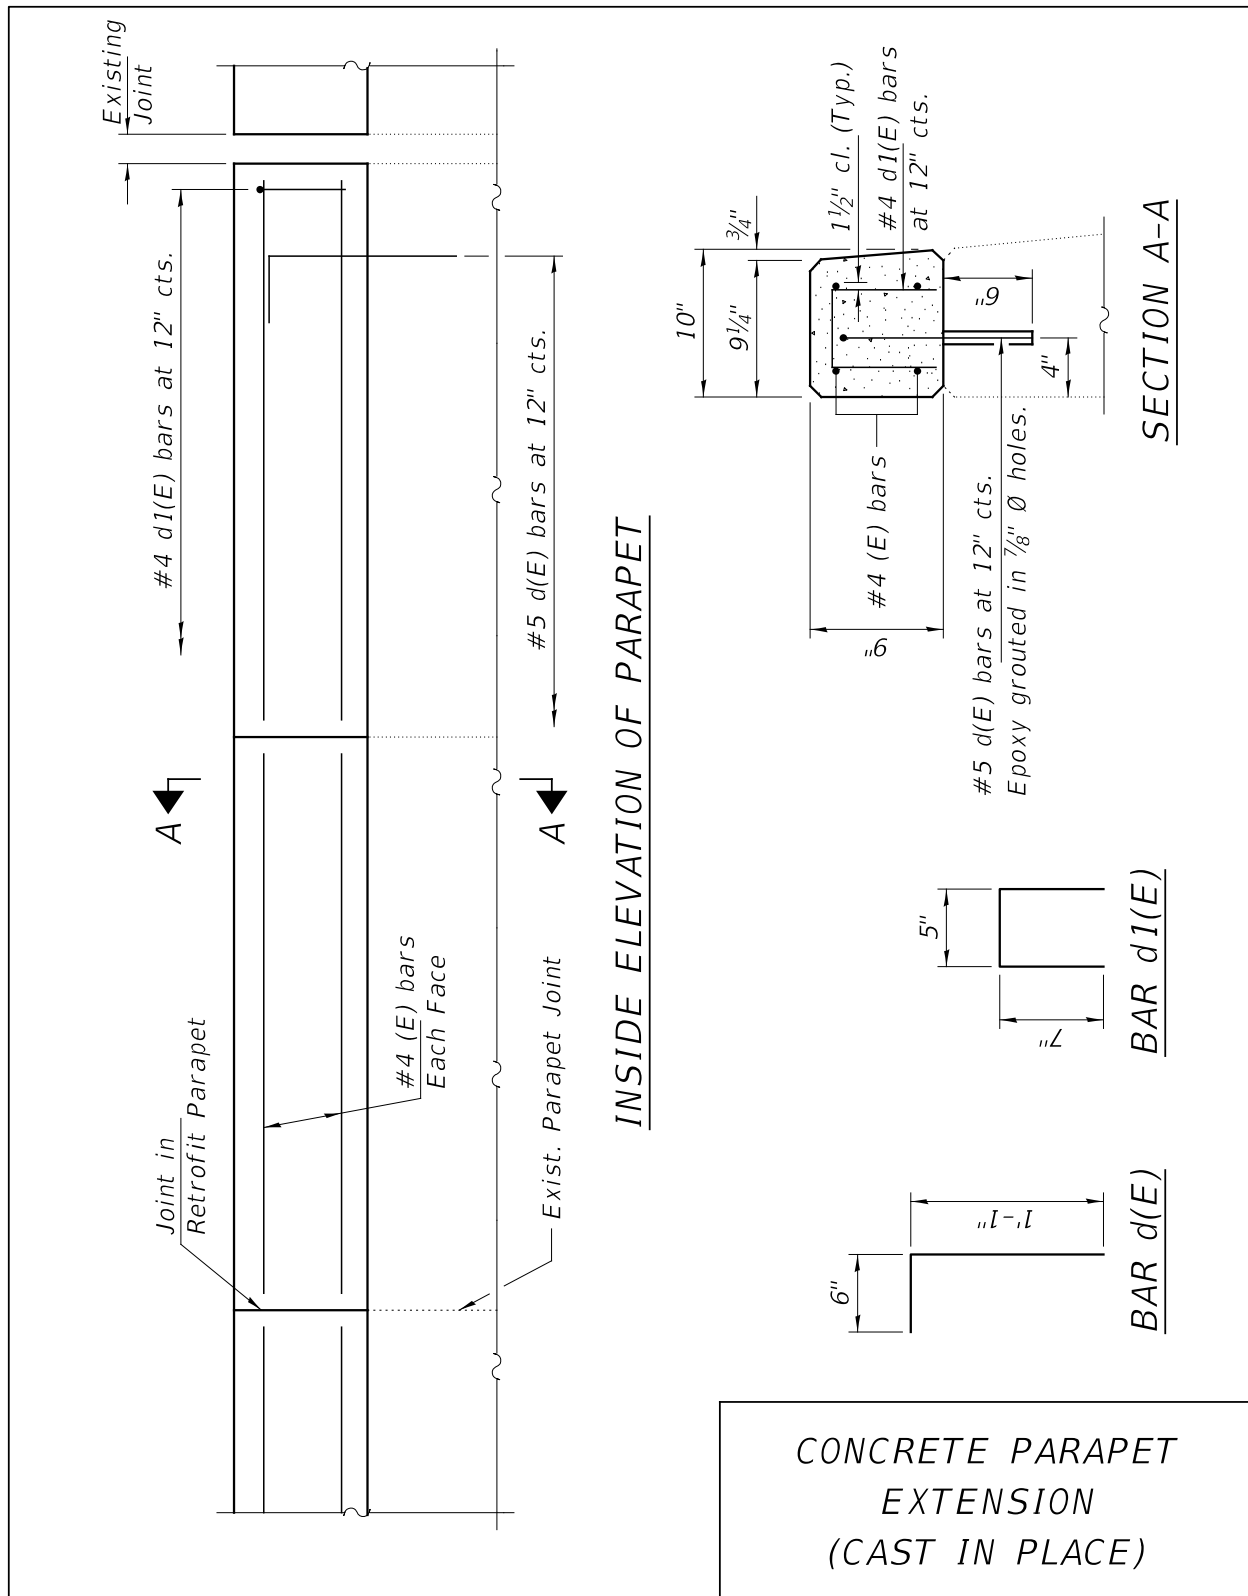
Concrete Parapet Extension (Cast in Place)
